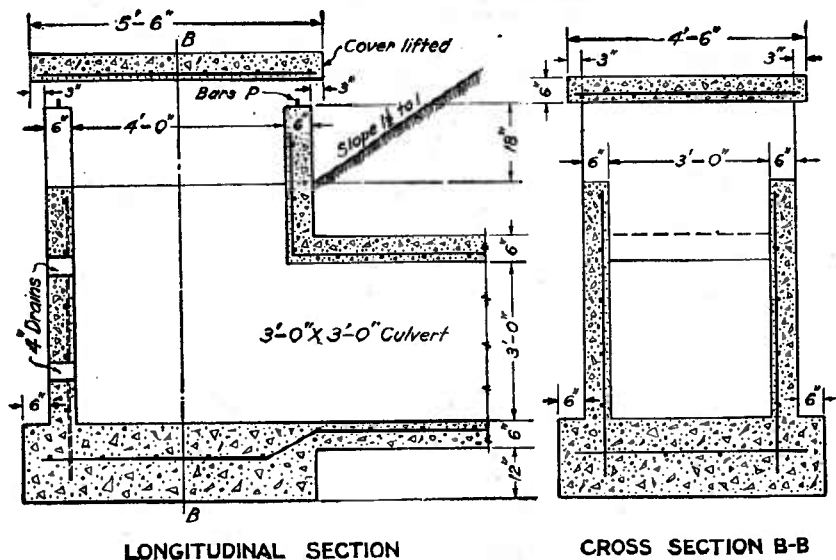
Reinforced concrete drop inlet for box culvert<sup>a</sup> shown in Figure 30
